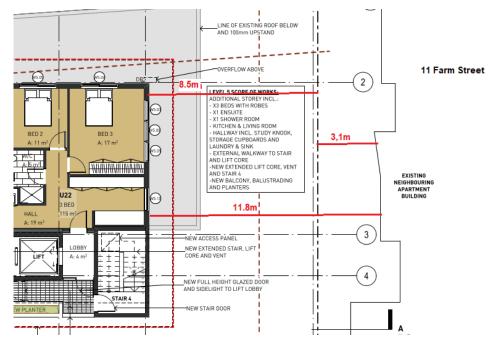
Floor plan illustrating the separation between the new addition and existing adjoining property along the eastern elevation.
